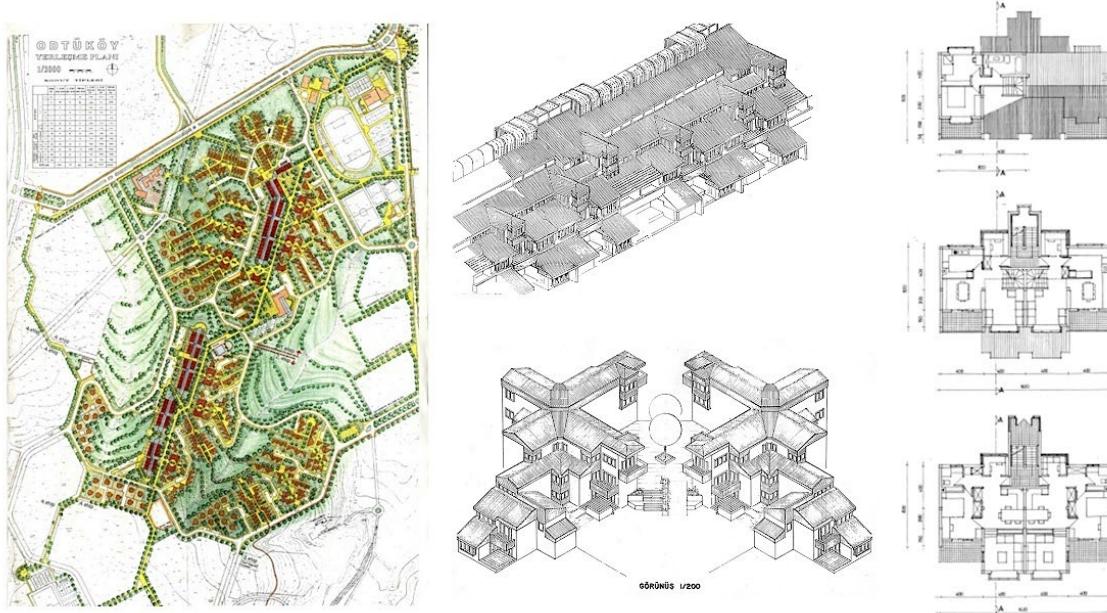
ODTÜ Kent (METU Town) lodgment plan layout, axonometric views of buildings and floor plans (Source: B. Günay, personal archive)
